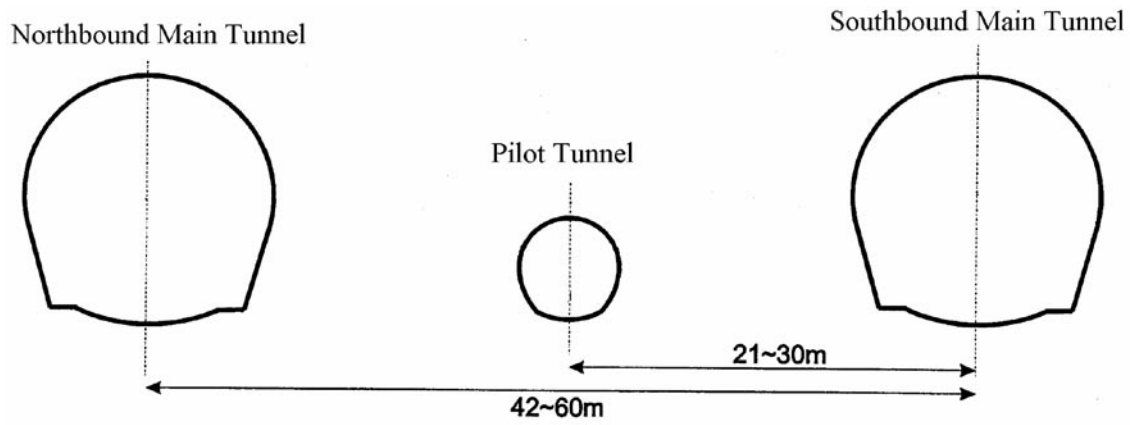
The Cross-section Layout of Hsuehshan Tunnel
